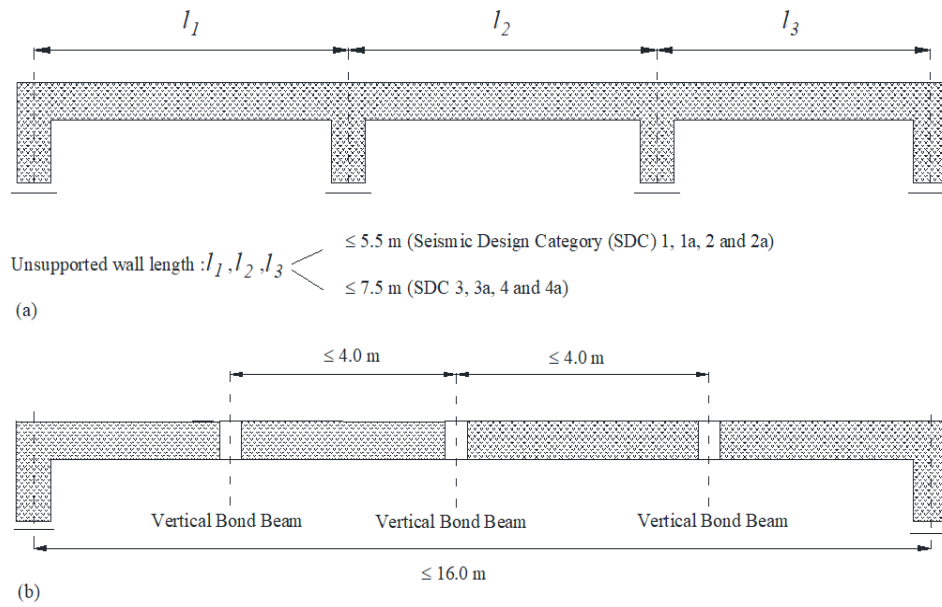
Using proper reinforced concrete bond beams on the gable wall (TBEC 2018)
